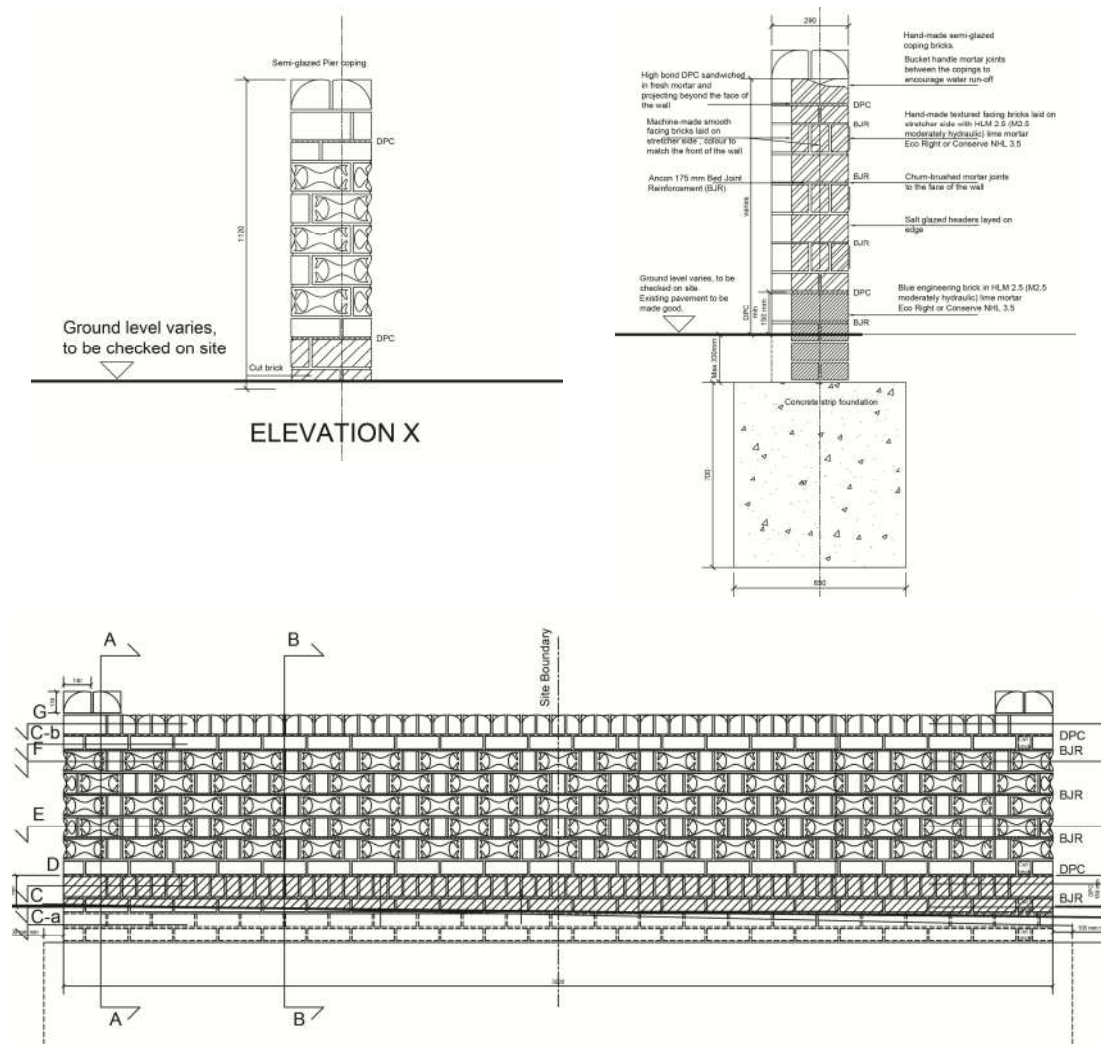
Drawings used for the information exchange with the engineer and utilised in the construction process by the bricklayers. Clockwise from top left: side elevation, section and front elevation of the wall
